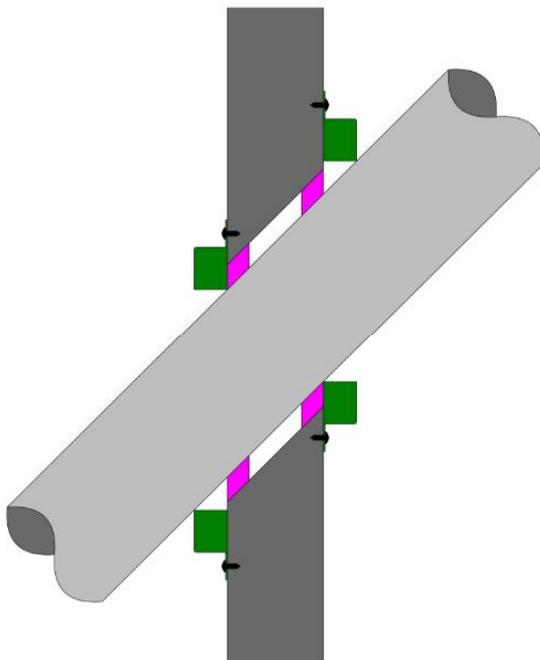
Typical installation of 30° angled pipe in wall with BOSS MaxiCollar™ on both faces
